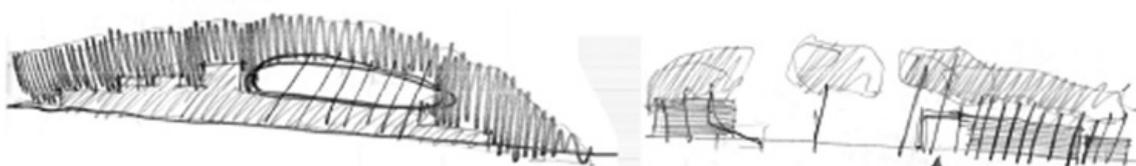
ABOVE: North west facade from the road (6/11 in situ)
